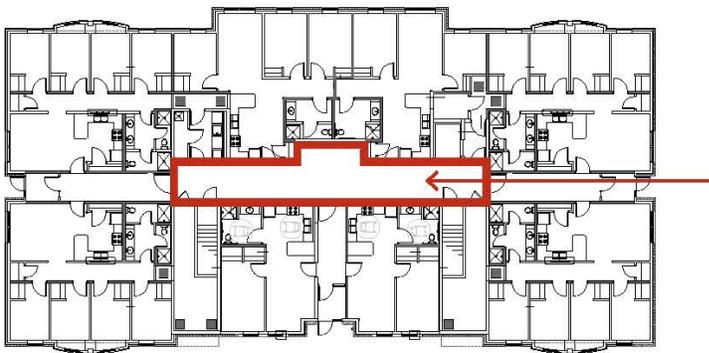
Spartan Hall Safe Room (Laugerman + Architects)
